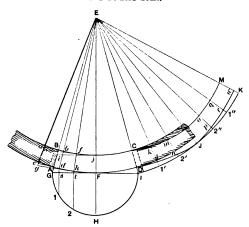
An Opening in a Circular Wall with Circular Soffit and Jambs Radiating to the Center from Which the Circular Wall Is Struck.
